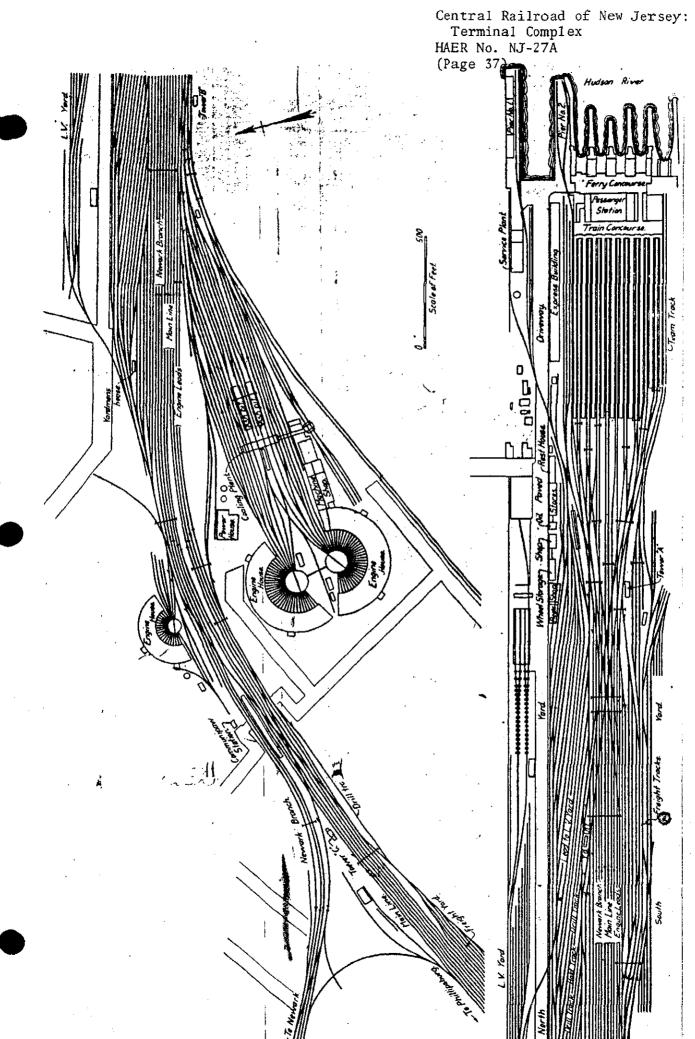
The revised track layout of the Central Railroad of New Jersey, between the Jersey City Terminal and Communipaw (Railway Age Gazette 1915: 788).
